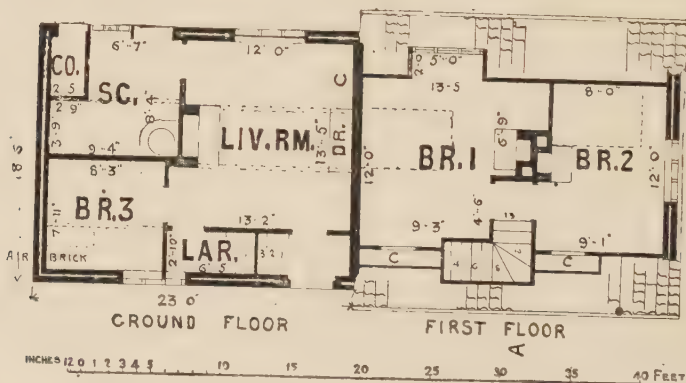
is a far better plan, but the external and internal doors of the scullery are so placed that there is a through draught from the outside driving straight at the fireplace of the living-
